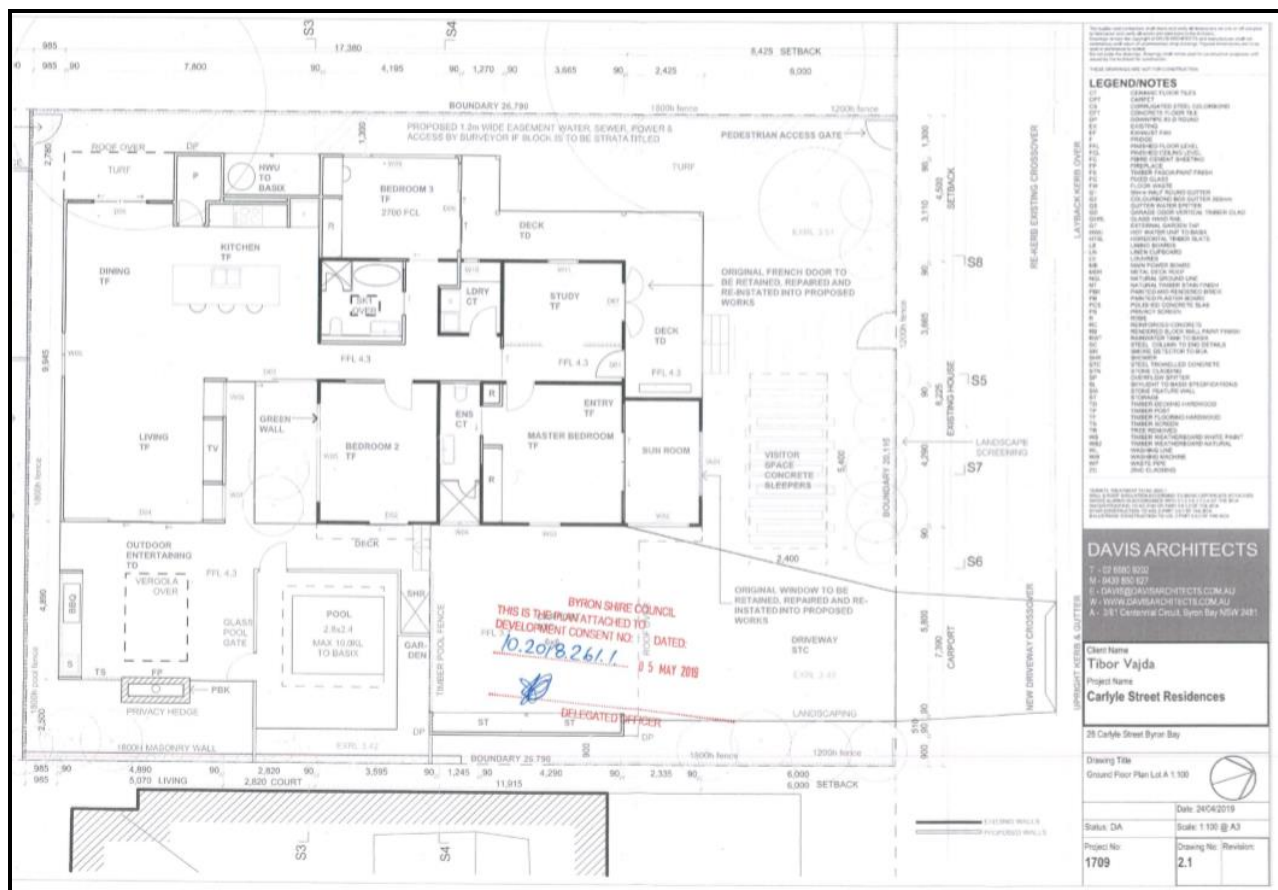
Extract from Stamped Plans showing the Approved Additions and Alterations
